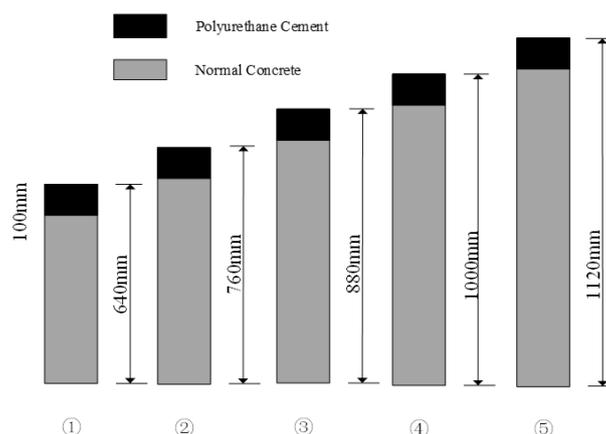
Schematic Diagram of Reinforcement by Changing Pier Height
